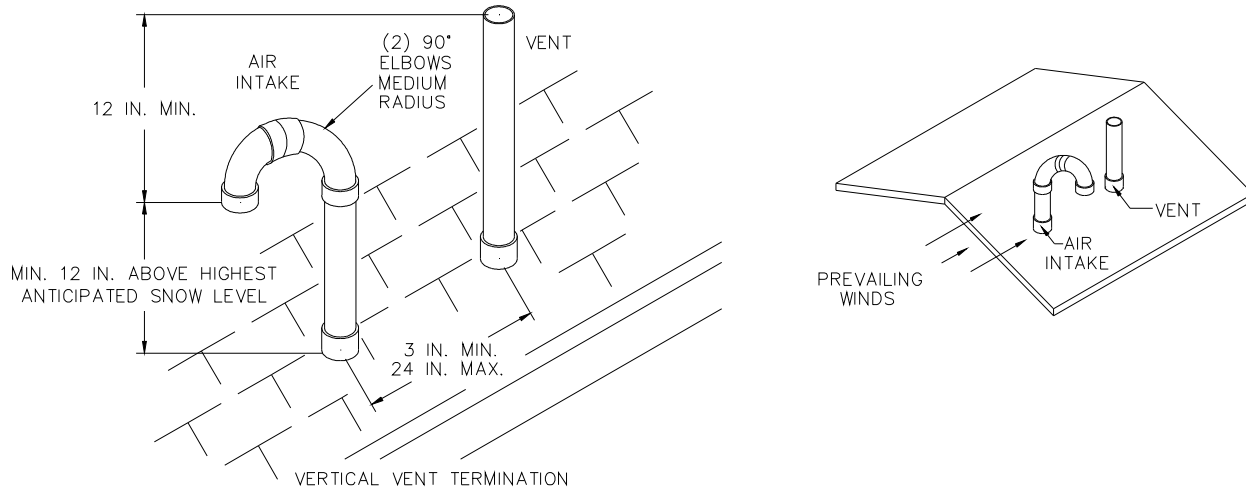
Typical Rooftop Vent and Air Intake Termination Construction Details
